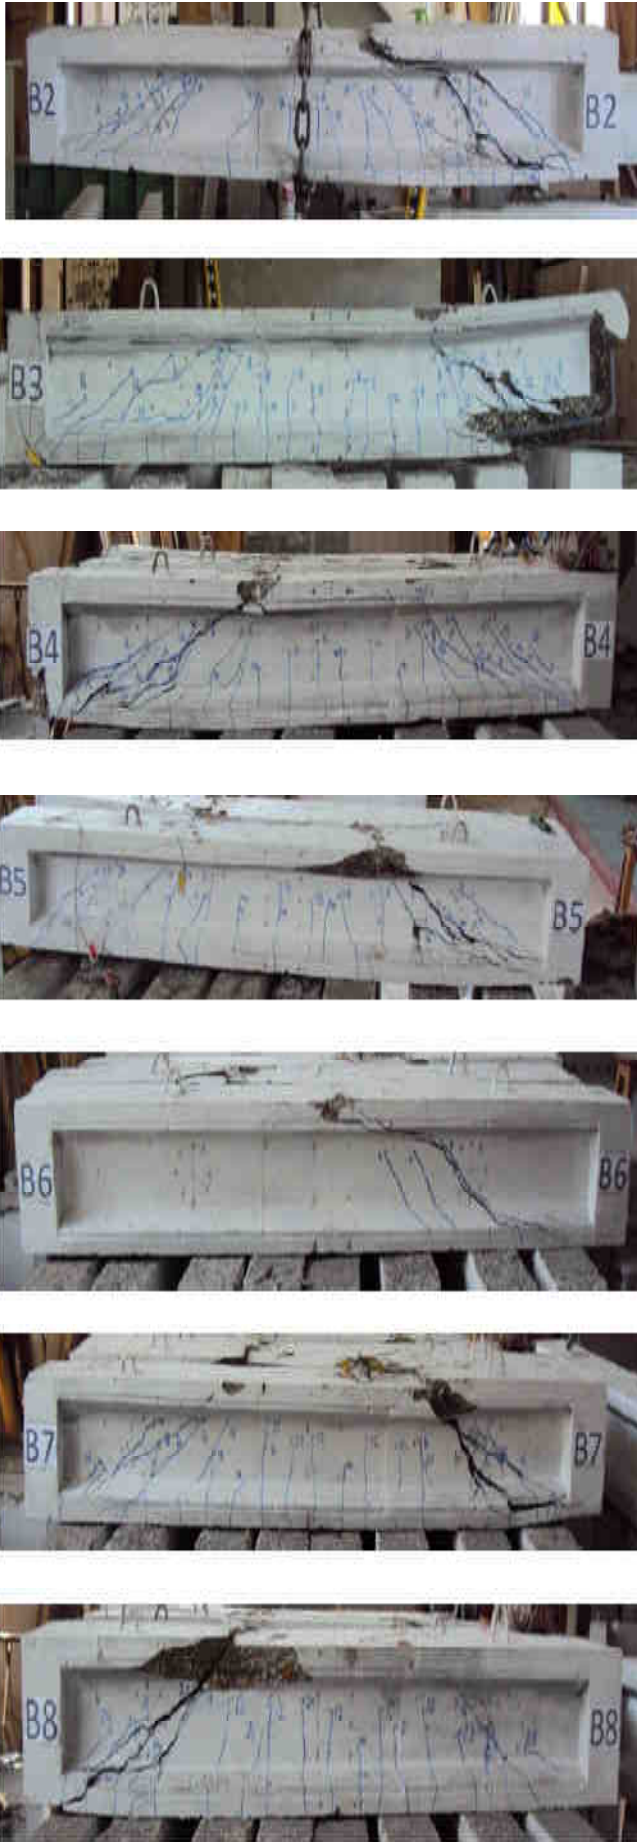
CRACK PATTERNS IN TESTED BEAMS.
